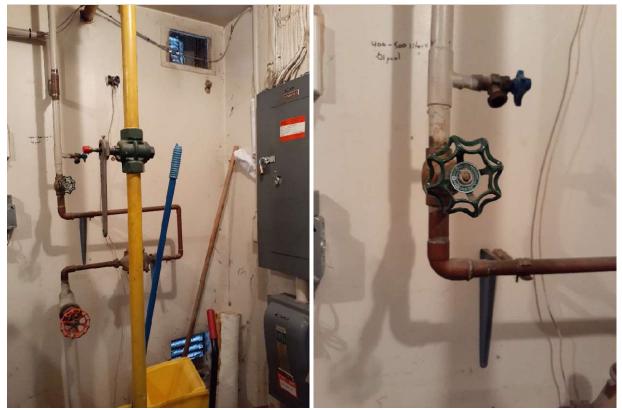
Representative photographs of the Mechanical Room in Building 141. Non-asbestos containing drywall joint compound located on the wall and ceiling [Sample ID: 141-AS-01A-C]. White paint on the wall [Sample ID: 141-LP-01; 1,900 ppm lead] confirmed to contain high levels of lead.
